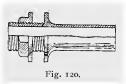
shows a part section and part elevation of an ordinary or a single-nutted boiler screw of brass. It is merely a short length of tube with a screw thread at one end, a flange abutting against the outside
